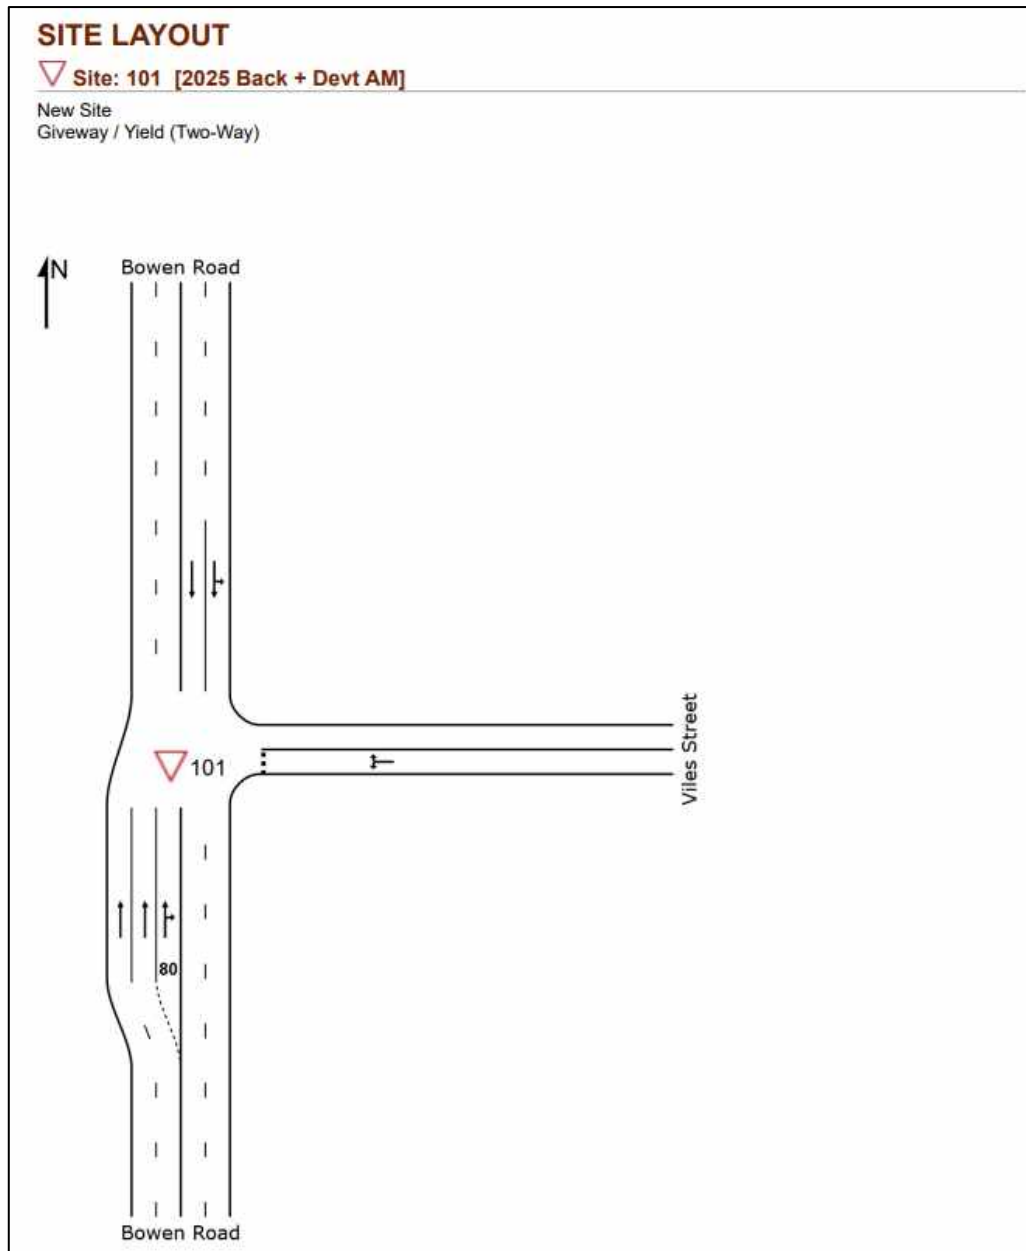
Post development Bowen Road/Viles Street Intersection Layout
